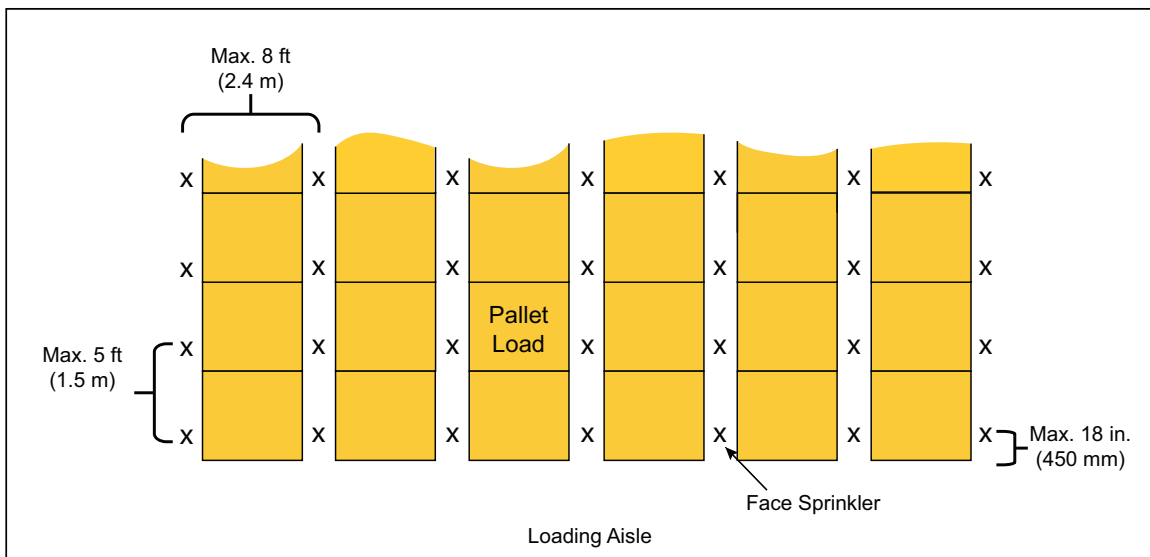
Plan view of IRAS(E) horizontal in-rack sprinkler arrangement for multiple-row racks
